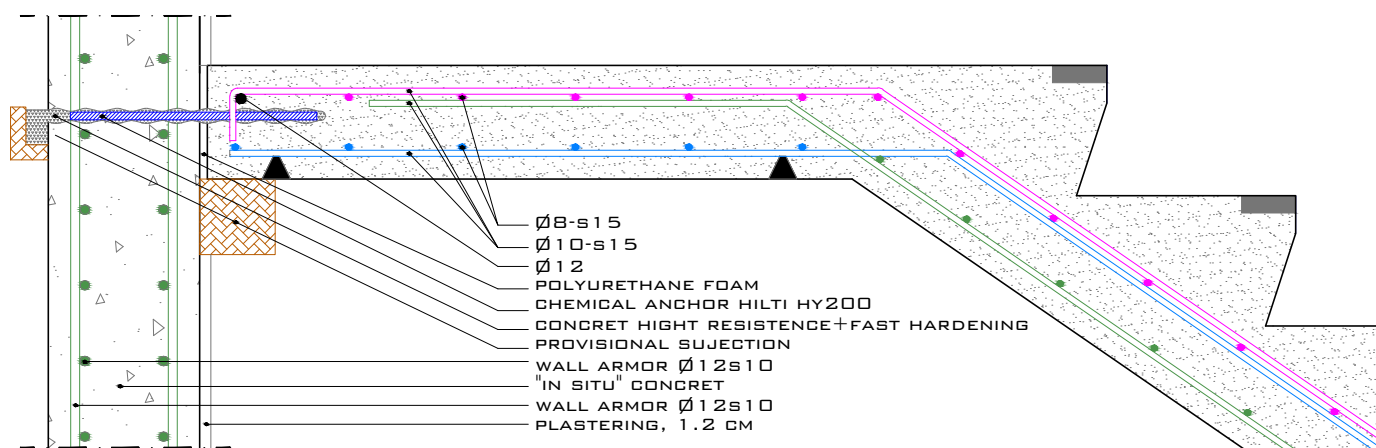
UNION PREFABRICATED STAIR-IN SITU FLOOR \_S:1/10
